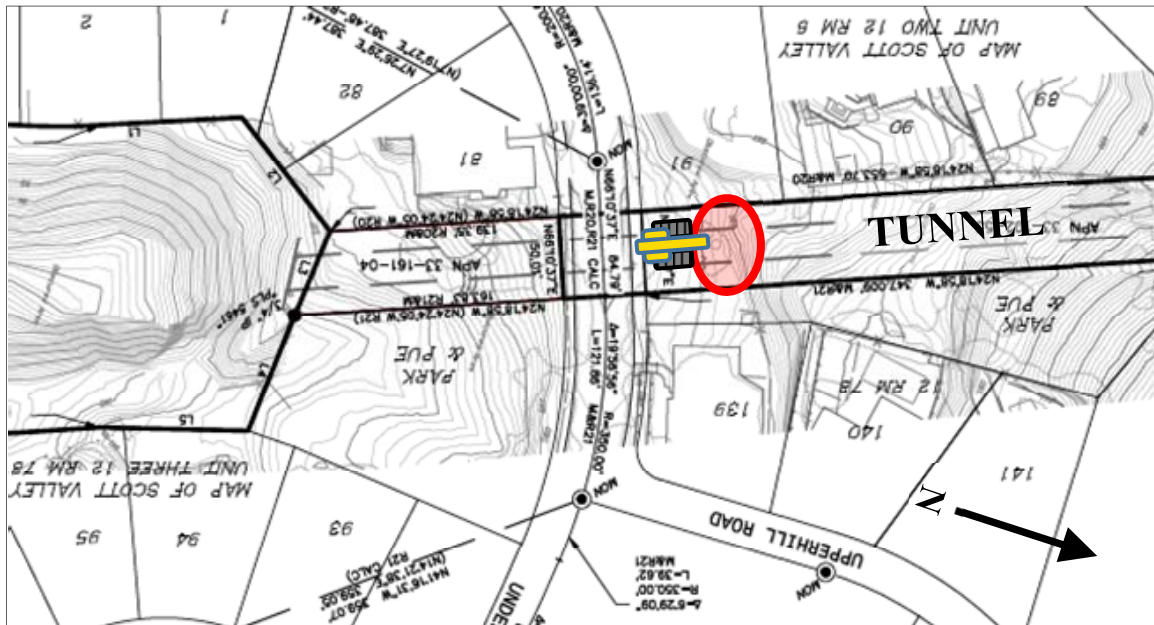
Drill rig and borehole locations above Alto Tunnel at the Underhill Road project site.
